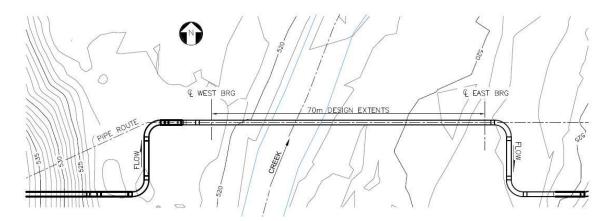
Project Site General Arrangement (Allnorth, 2015)
